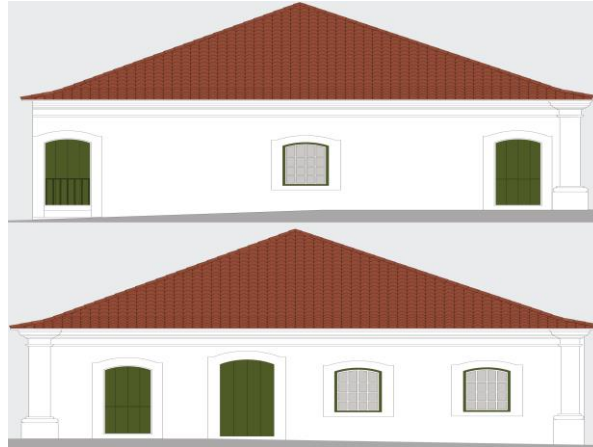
Northern (up) and western (down) walls elevations (Arquivo Arquitetura, [6]).
